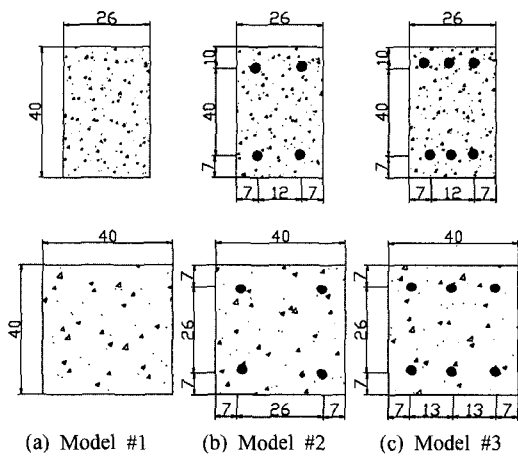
Sections of beam (40×26) and column (40×40) for 3 types of test models (unit: mm)
